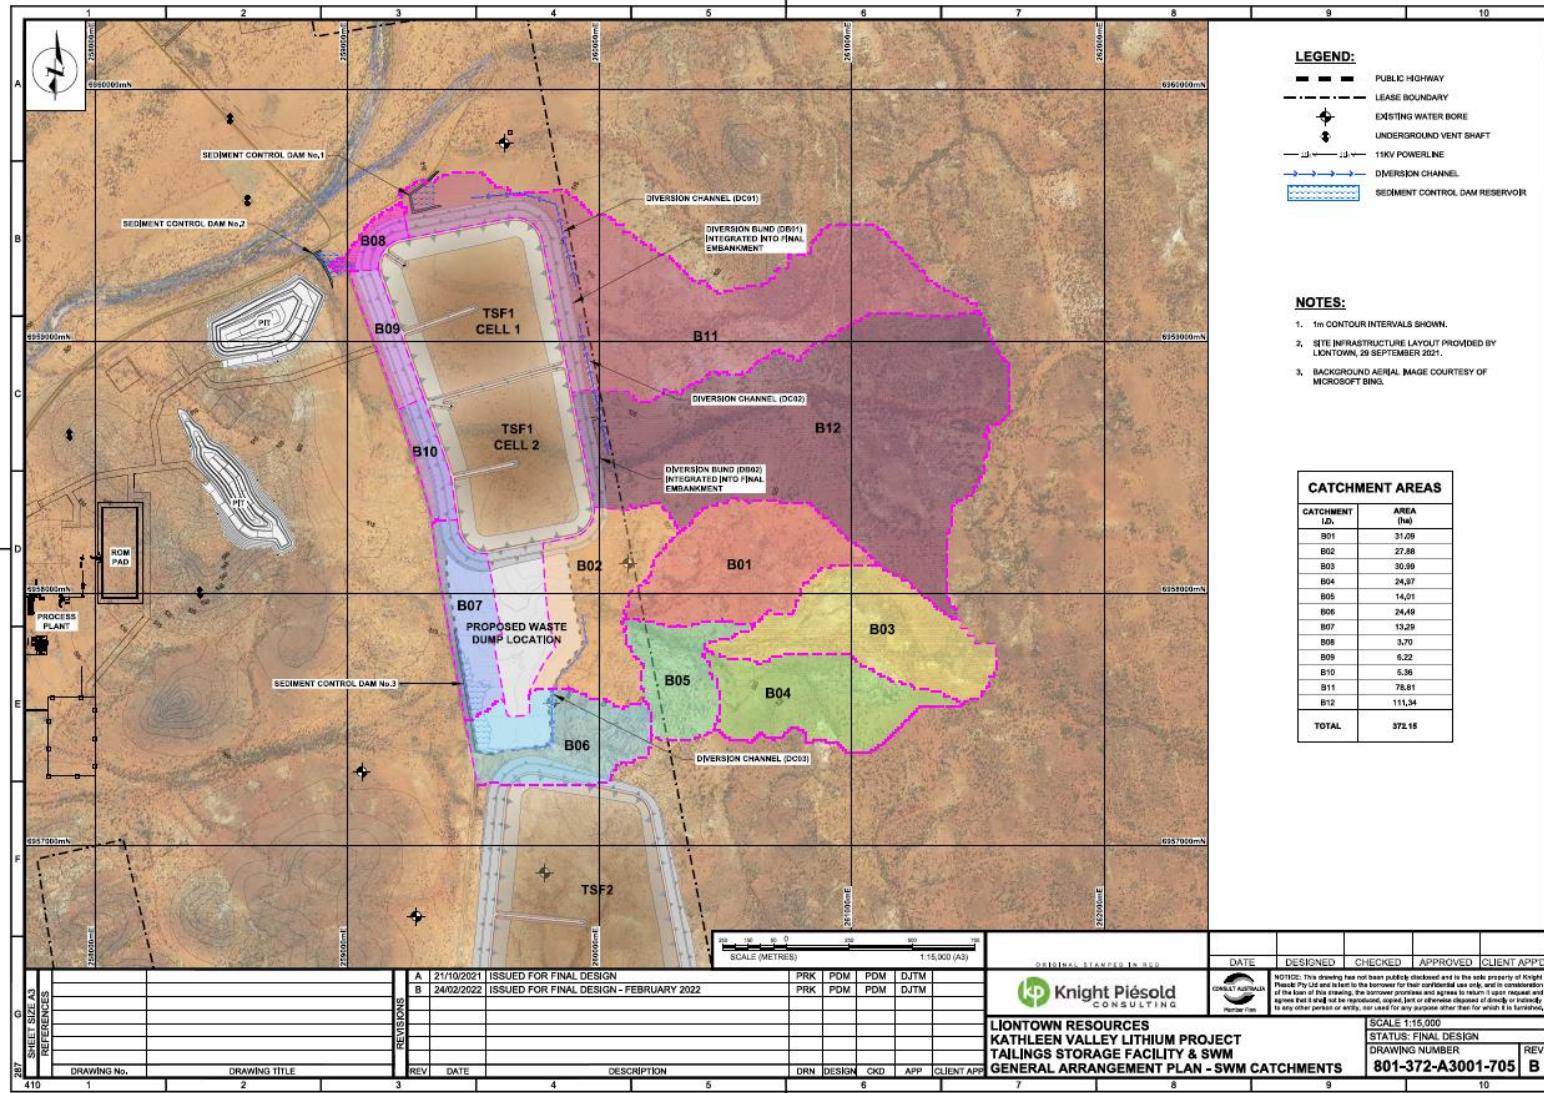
Tailings Storage Facility Surface Water Management – 801-372-A3001-705
